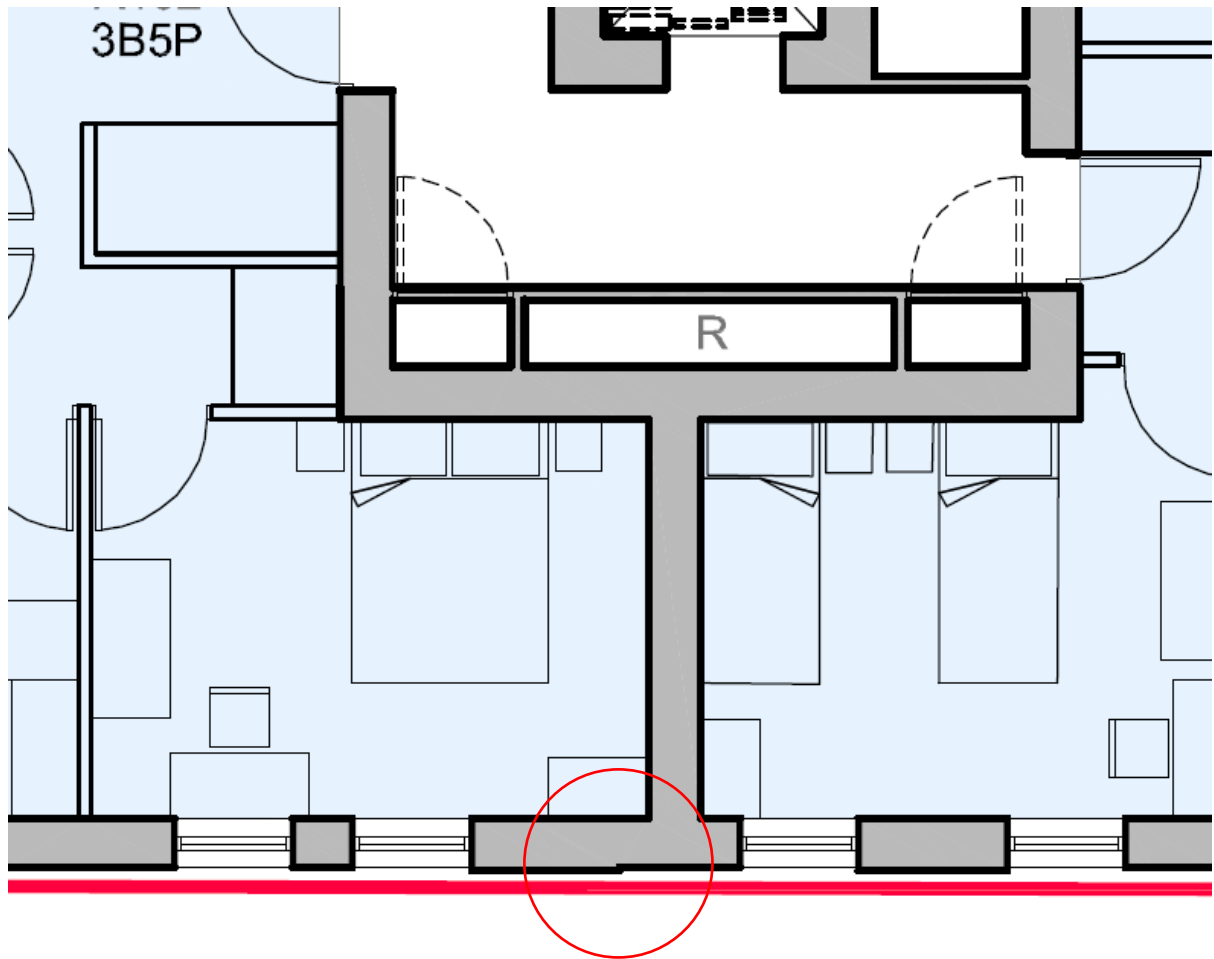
Extract from Proposed First Floor Plan, Drawing no. 194/PL06/P2
